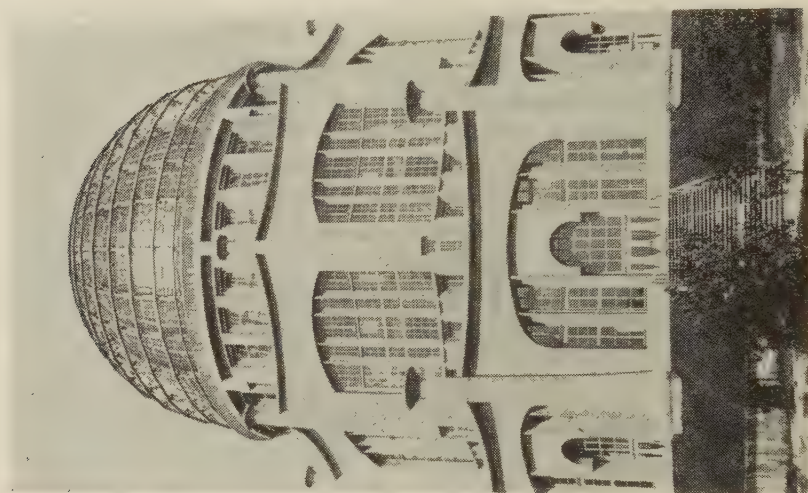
THE STEEL AND REINFORCED CONCRETE SKELETON OF THE TEMPLE AT WILMETTE, ILLINOIS—ON SHERIDAN ROAD WHERE IT TURNS TOWARD LAKE MICHIGAN
